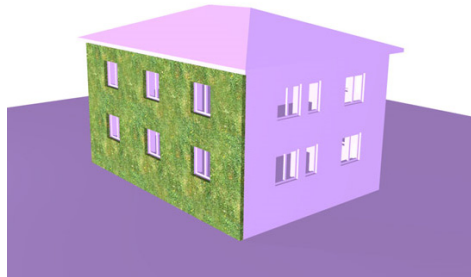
Case study: a 98m² south-oriented Vertical Greenery System installed on a 1000m³ building façade.
